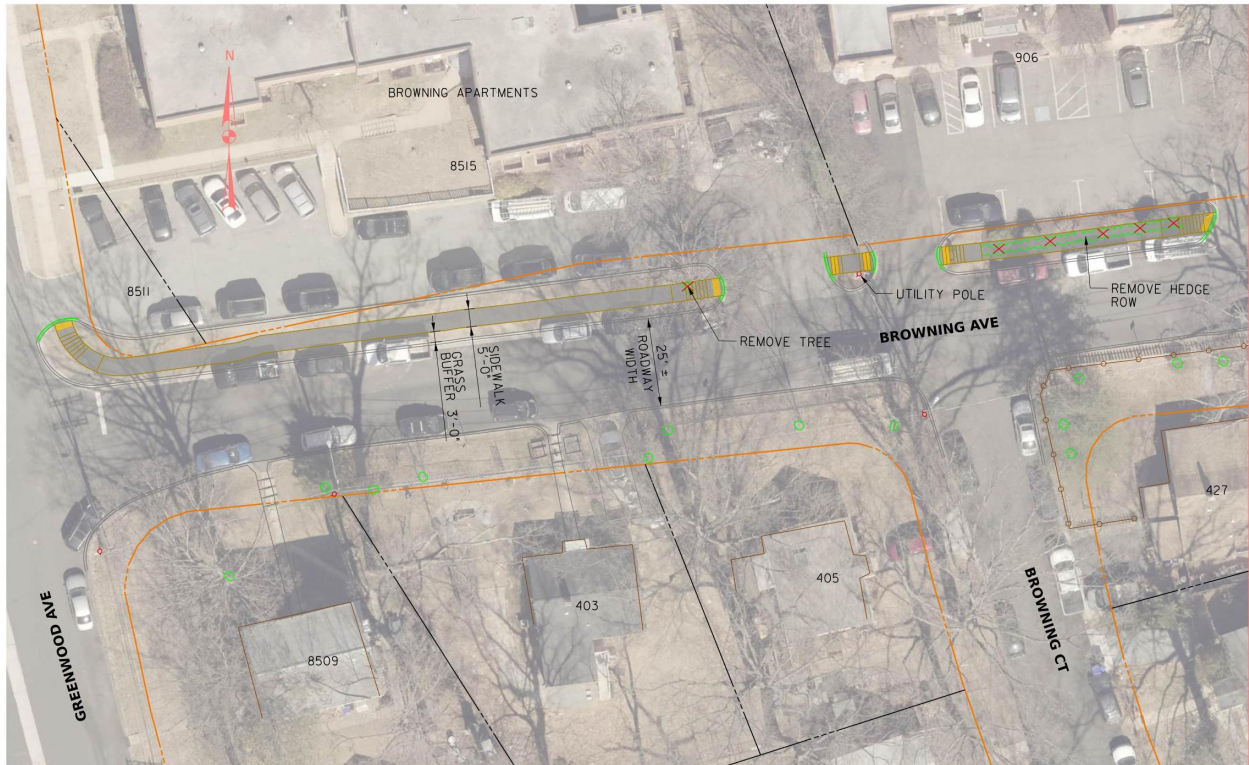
Site plan for proposed sidewalk improvements along Browning Avenue near Greenwood Avenue, showing new 5-inch concrete sidewalk segments, ADA-compliant curb ramps with detectable warning surfaces at intersections and crossings, retaining wall sections, driveway connections, right-of-way boundaries, utility pole location, tree removal and hedge removal areas, adjacent properties (including Browning Apartments), roadway widths, and a graphic scale from 0 to 290 feet.
